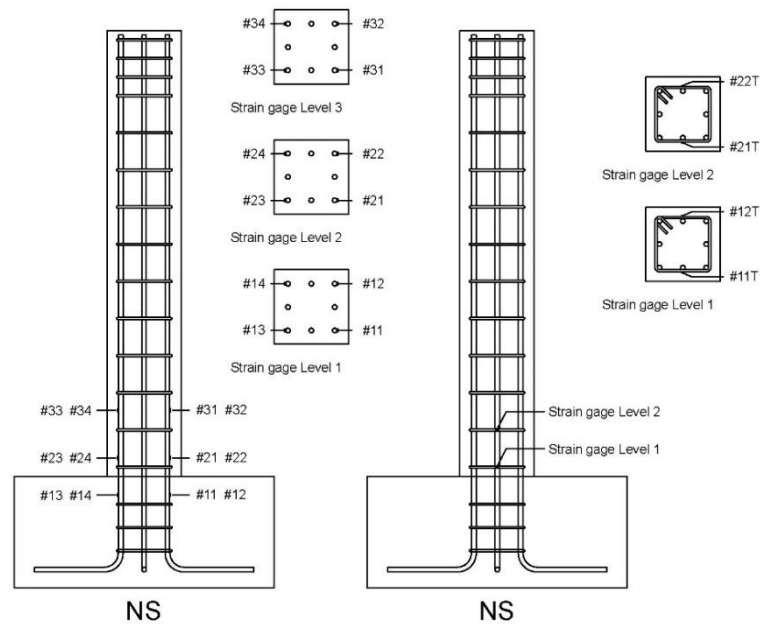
Detailing of strain gauge on reinforcements of NS column
